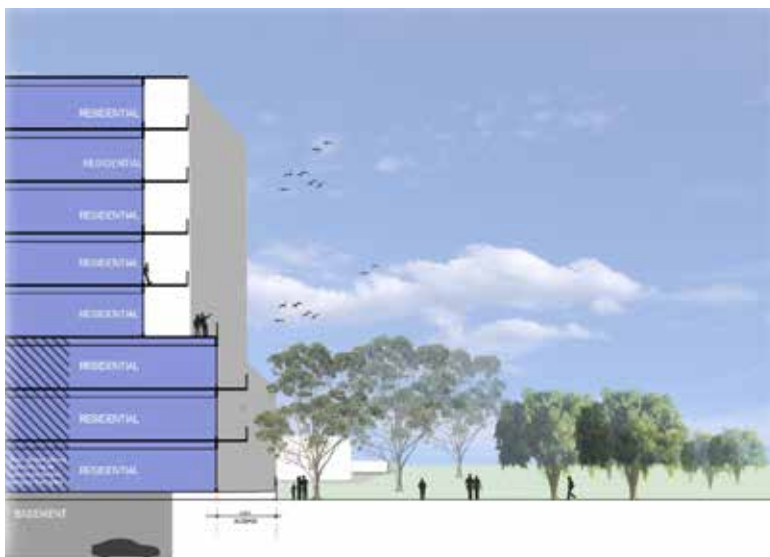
\_ Typical cross section of high density residential directly adjoining public open space
